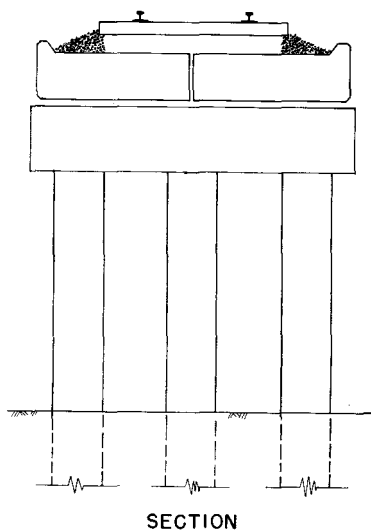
A—Cross section of typical concrete slab span shown in figure 1.
